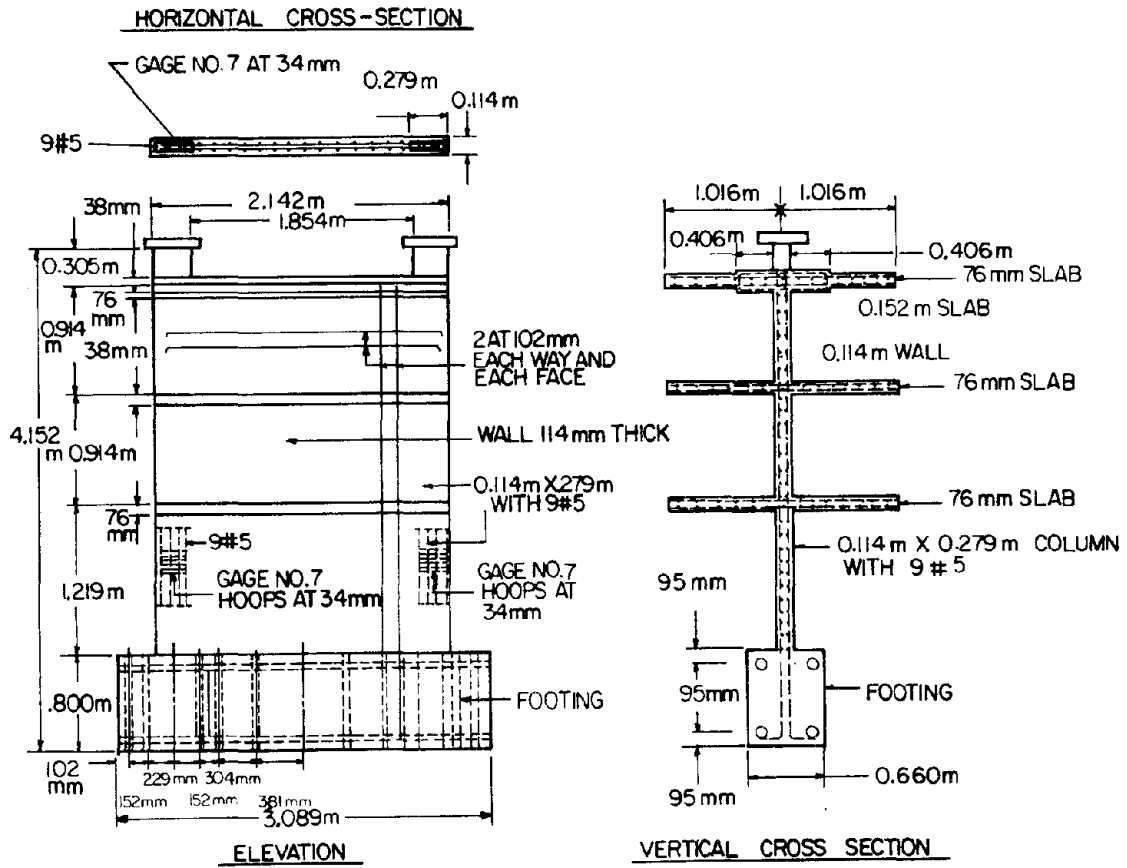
Dimensions and Details of Rectangular Specimens
